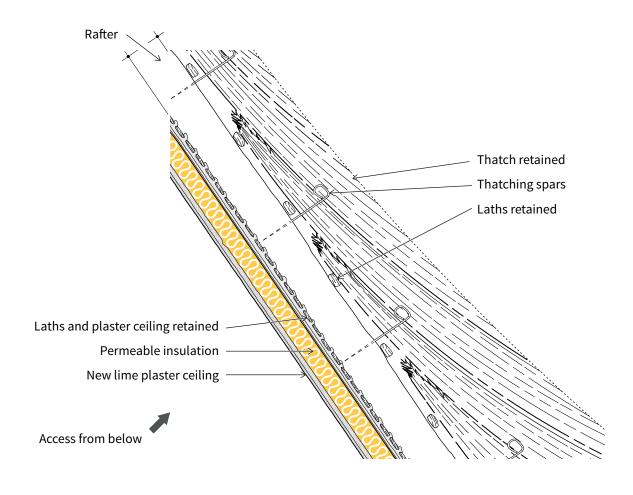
Warm roof – sloping ceiling (adding insulation from below – thatch retained)
